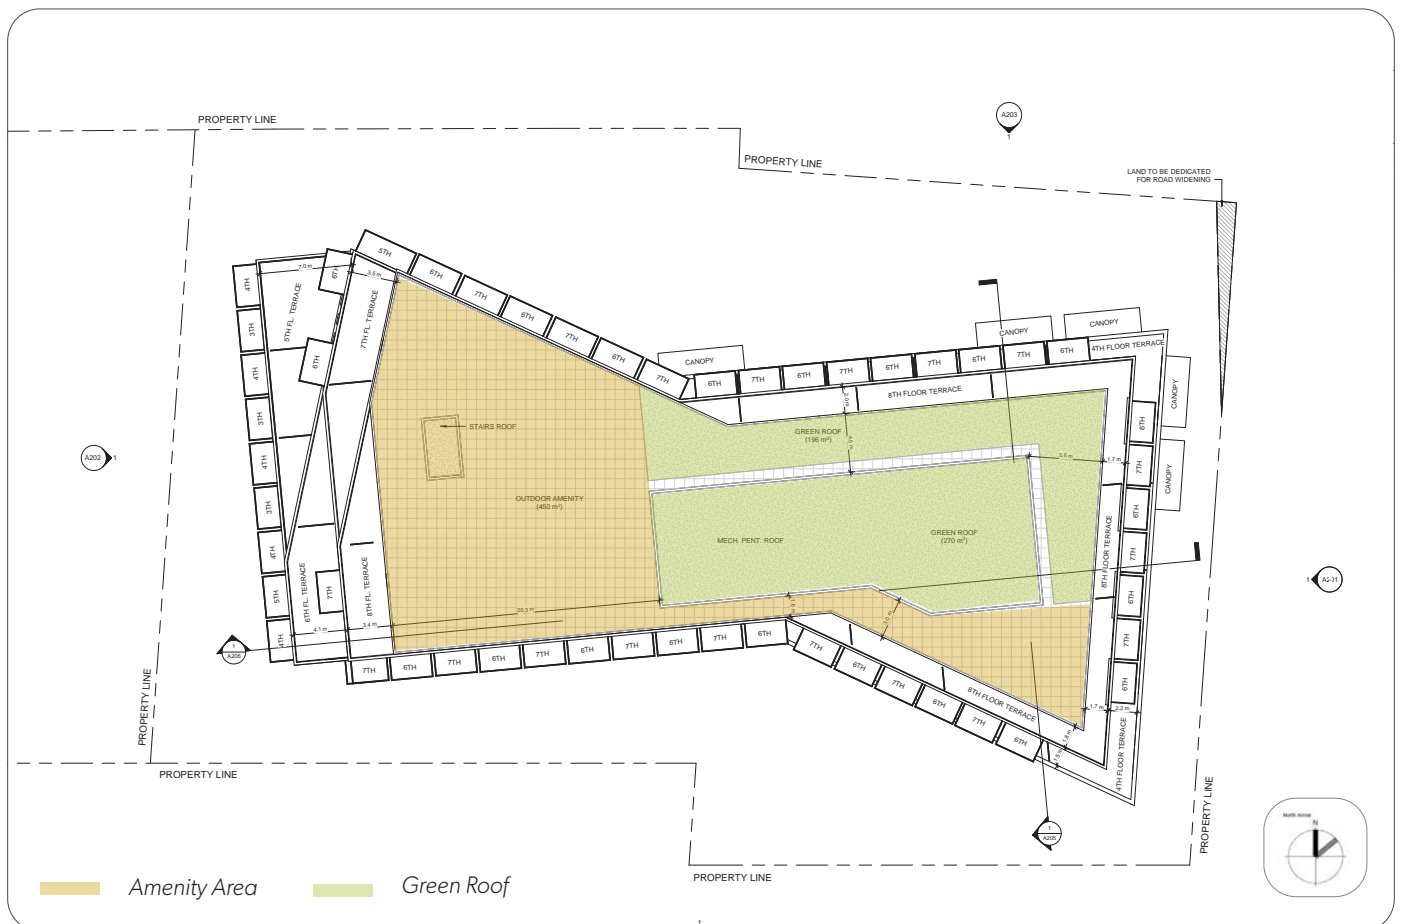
Roof Plan showing rooftop amenity and green roof of mechanical penthouse, prepared by KFA Architects + Partners Inc.
